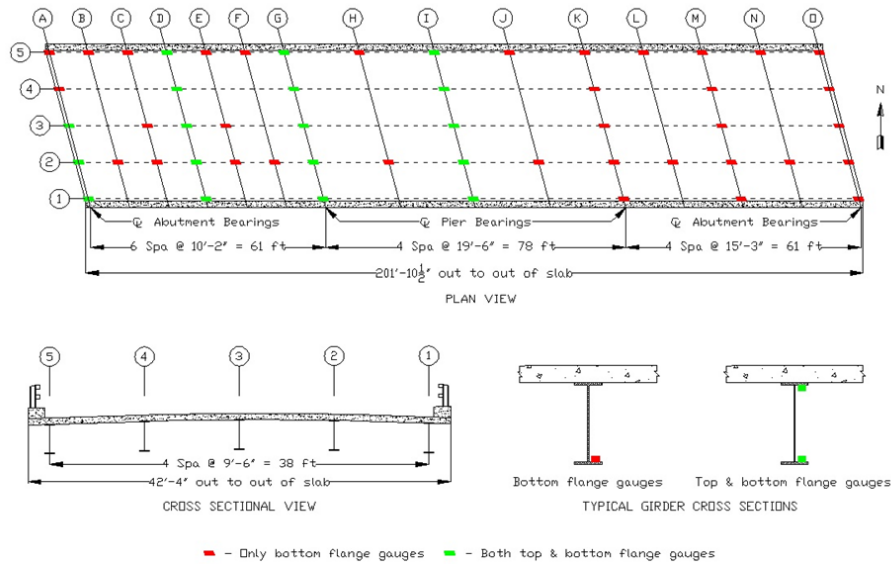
I-80 Bridge, Instrumentation Plan Girder Gauges
